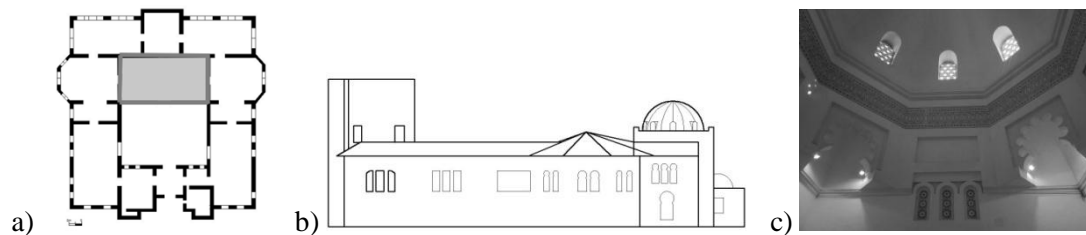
(a) Ground floor (b) Elevation (c) Temporary exhibitions space.
